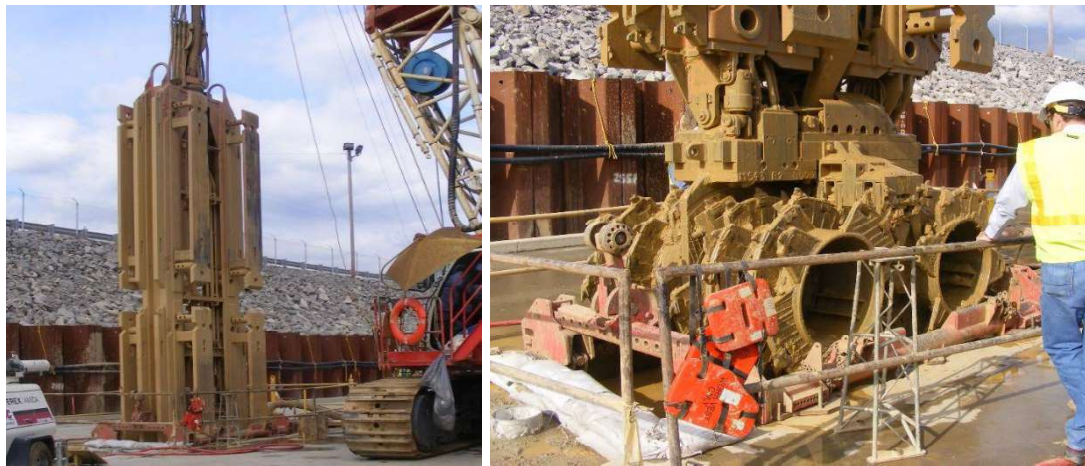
Excavation of a Diaphragm Wall or Barrette Using a Hydromill
